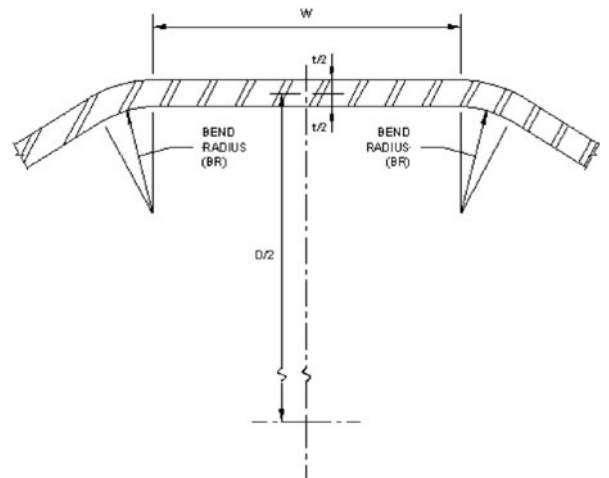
Typical Dimensions of Polygon Sections.
